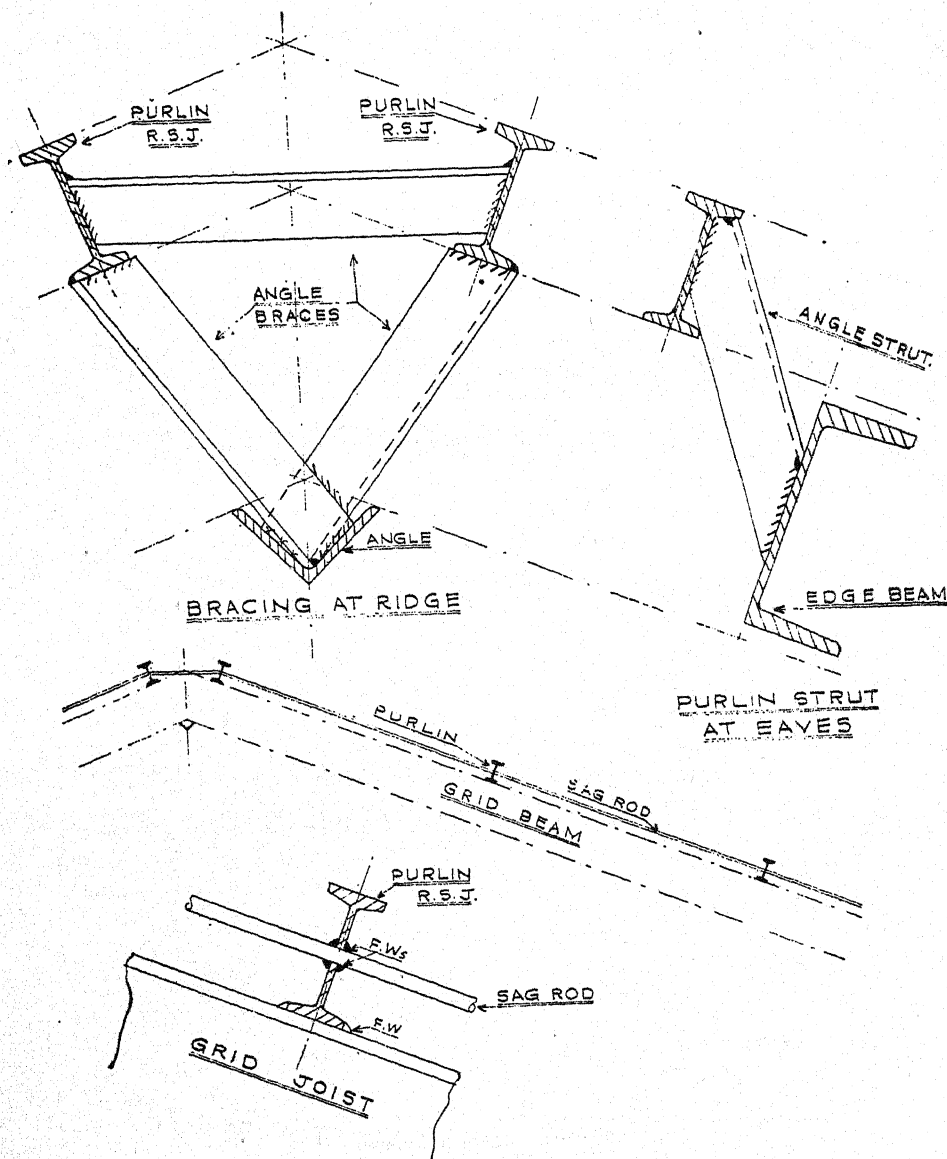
Details of rods welded to purlins in the plane of the roof to prevent sag.
